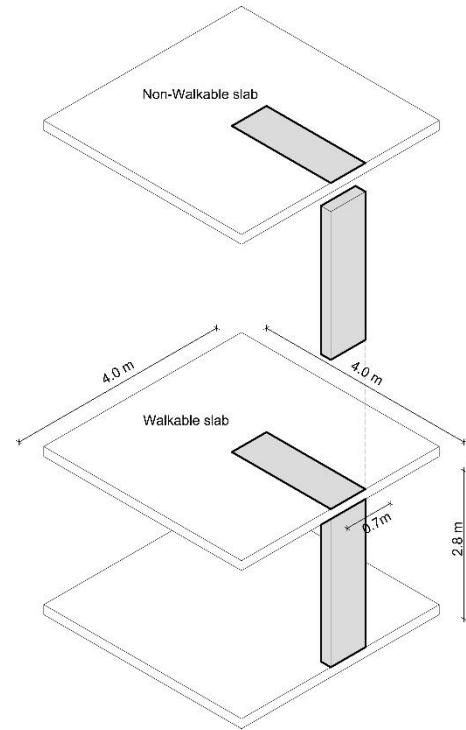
Structural scheme for a 2-storey space of 4 m x 4 m
